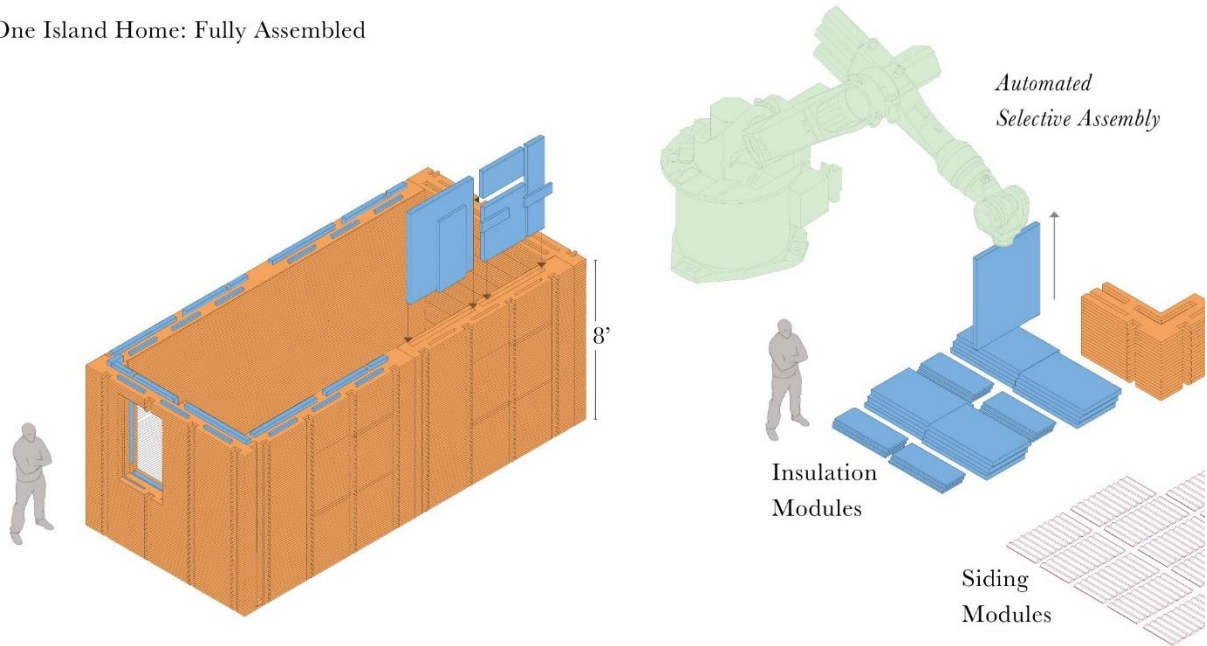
One Island Home: Full assembly of multiple wall panels. The process involves selective assembly of large modules by robotic assembler.
